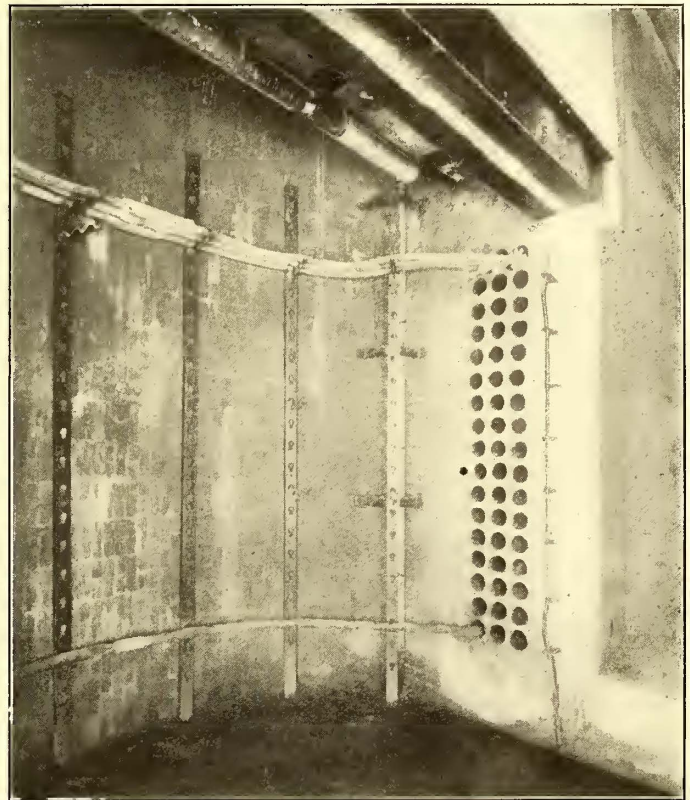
INTERIOR OF MANHOLE, SHOWING DESIRABLE ARRANGEMENT OF DUCTS
